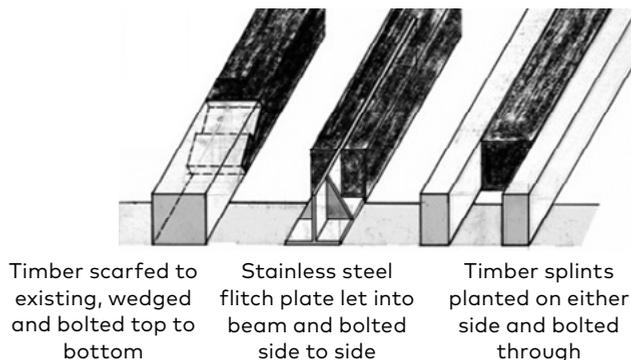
Typical solutions where a beam end has decayed (Russell, 2020).
